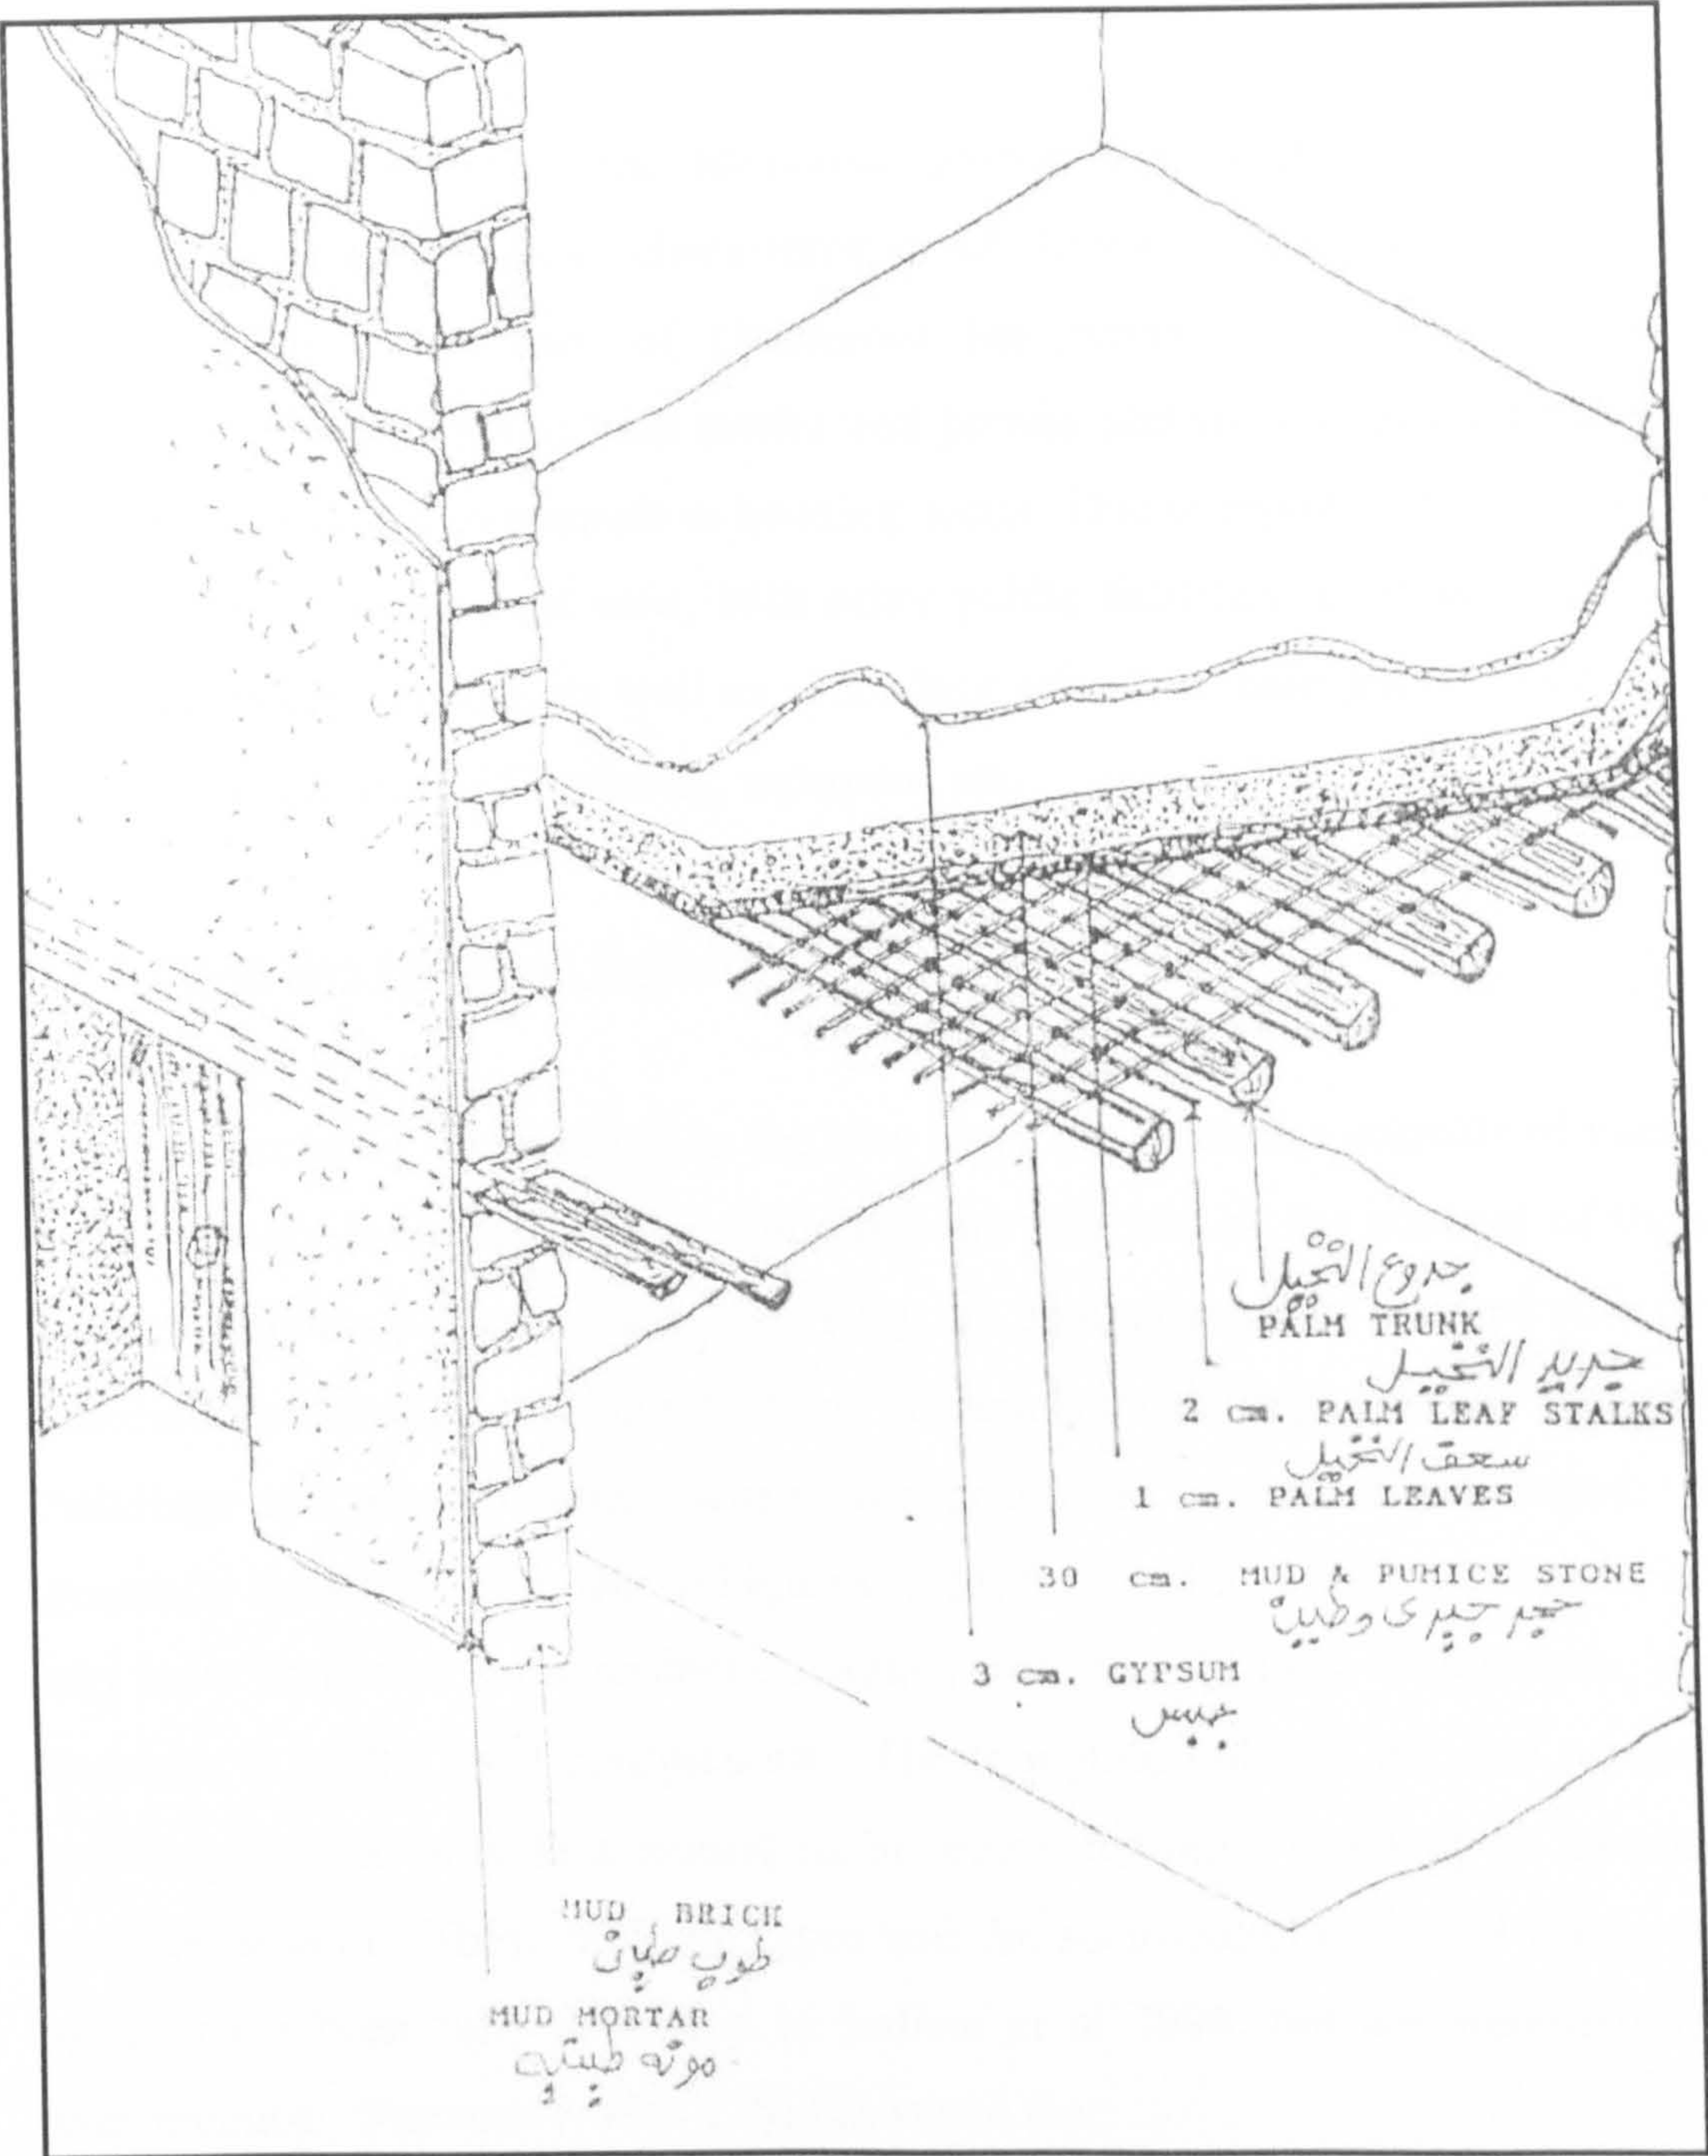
Traditional Constructed Building Materials at the Old Town of Ghadames.
